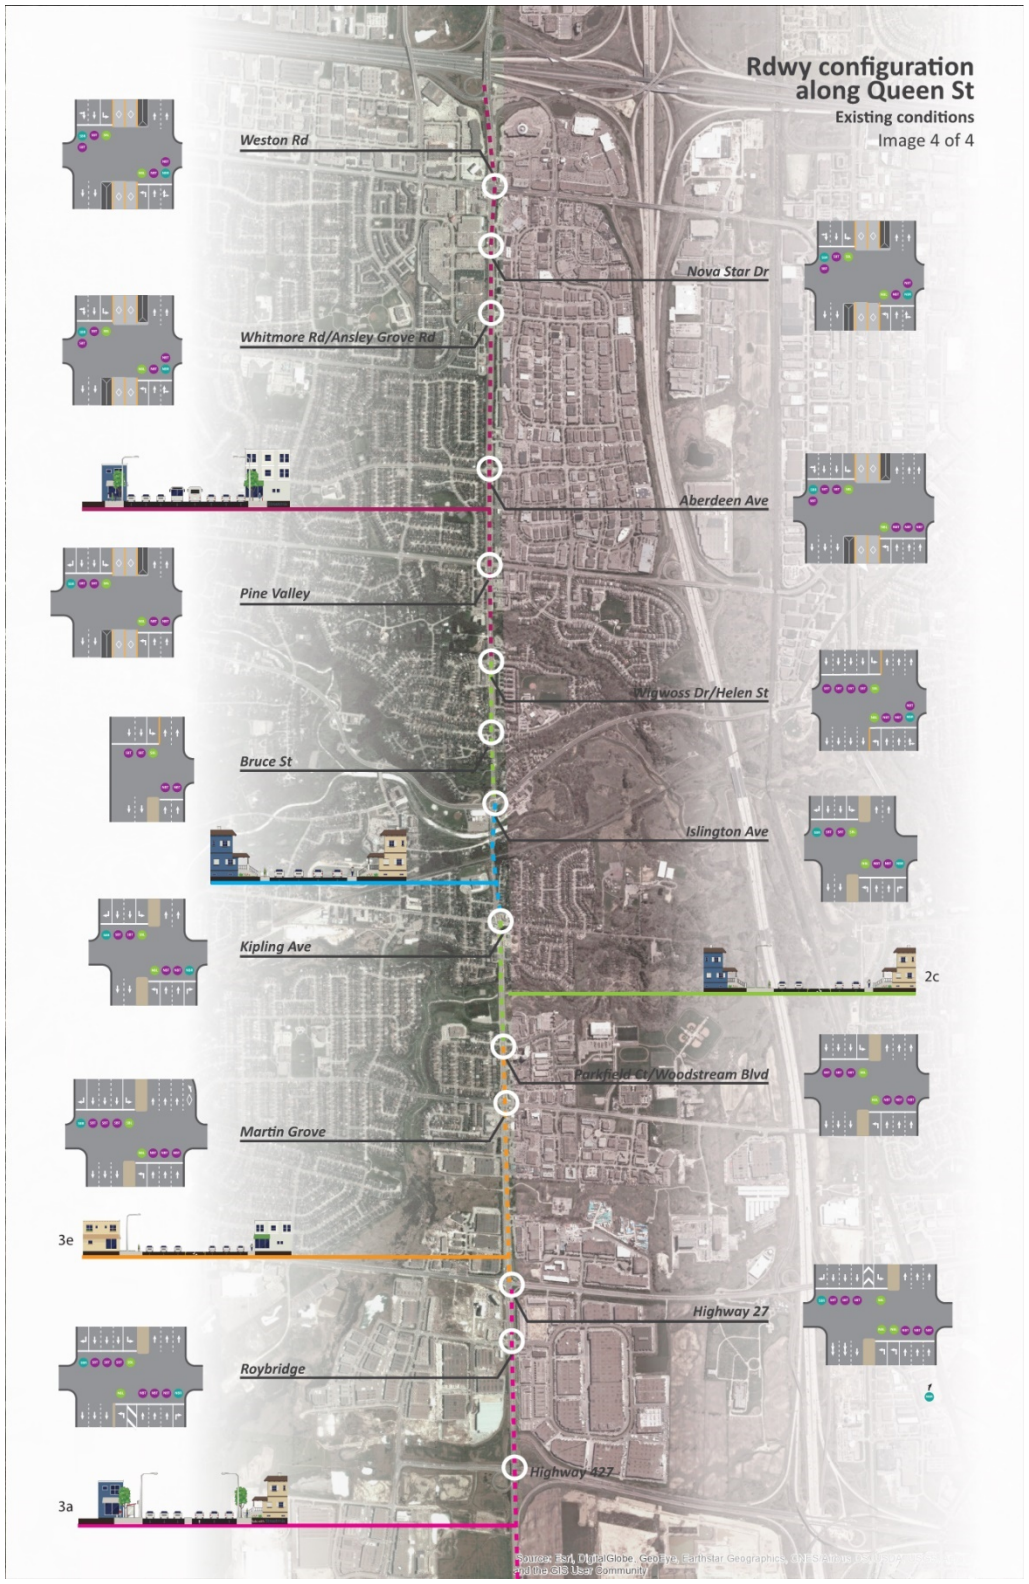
Roadway configuration along Queen Street/Highway 7, Highway 427 to Weston Road
